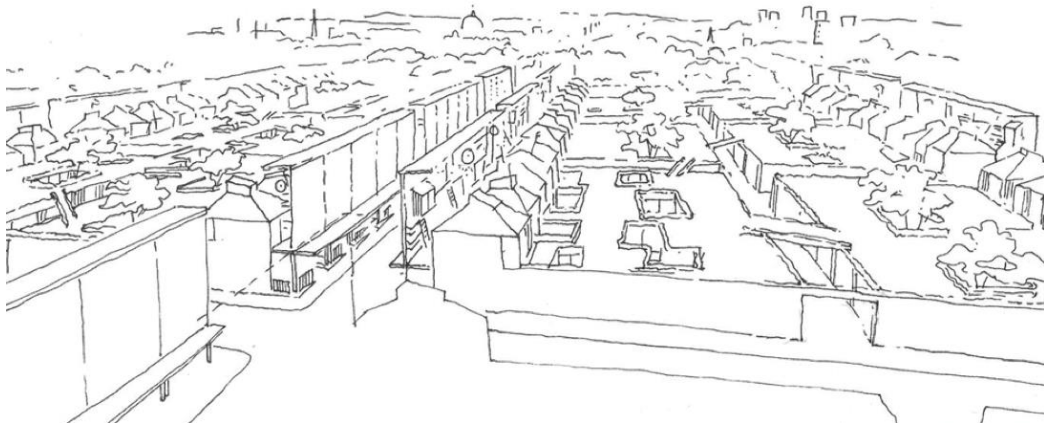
Concept drawing for the Slim House (Pierre d'Avoine Architects 2005)
